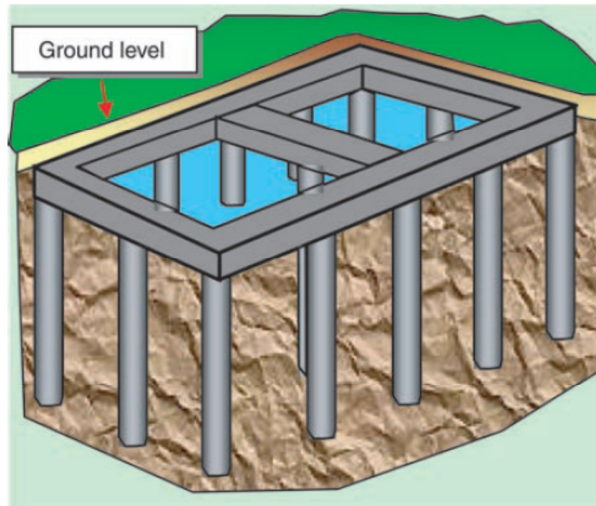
Isometric view of a pile and beam foundation (Cooke, 2007)
